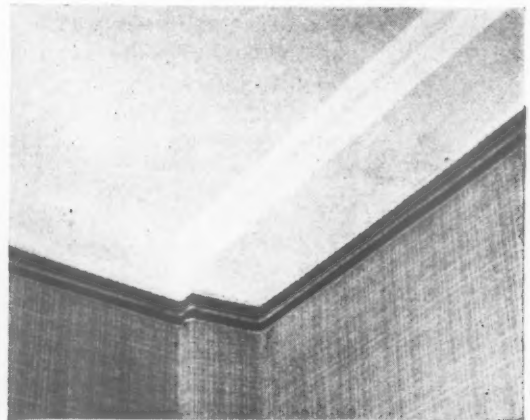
(above right). Detail of the corner of a room showing papering direct on to the 4-cm. thick precast concrete wall panels, and the exposed junction of the ribs in the corner. The concrete finish in this block the "House of Lyagutenko" was exceptionally good.
